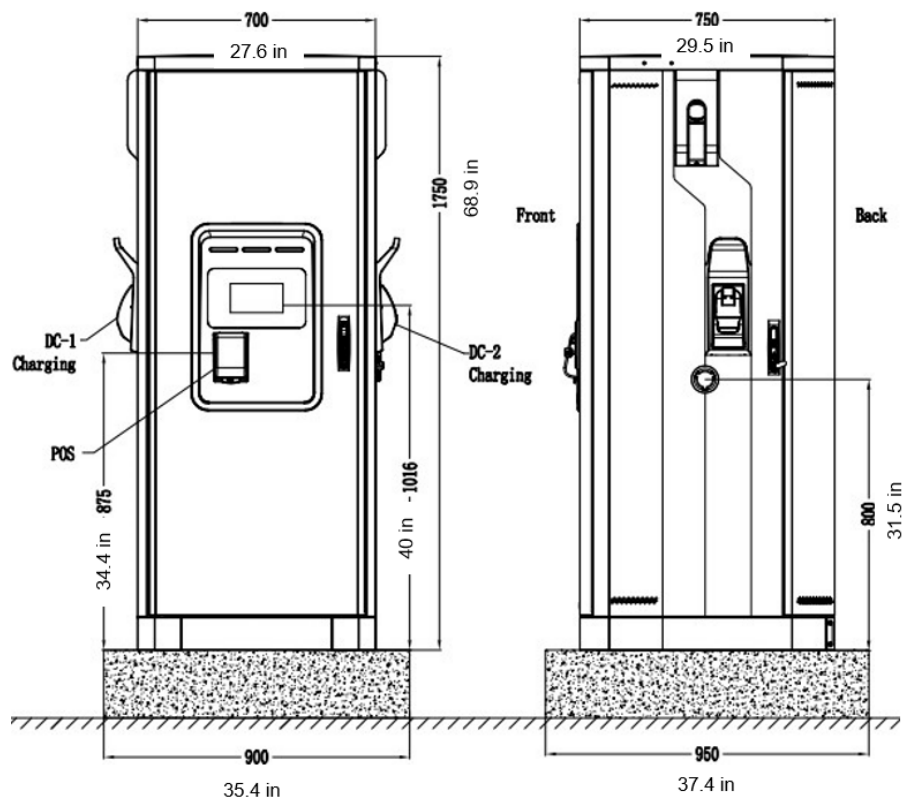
Expansion Bolt Fixing of Concrete Foundation
